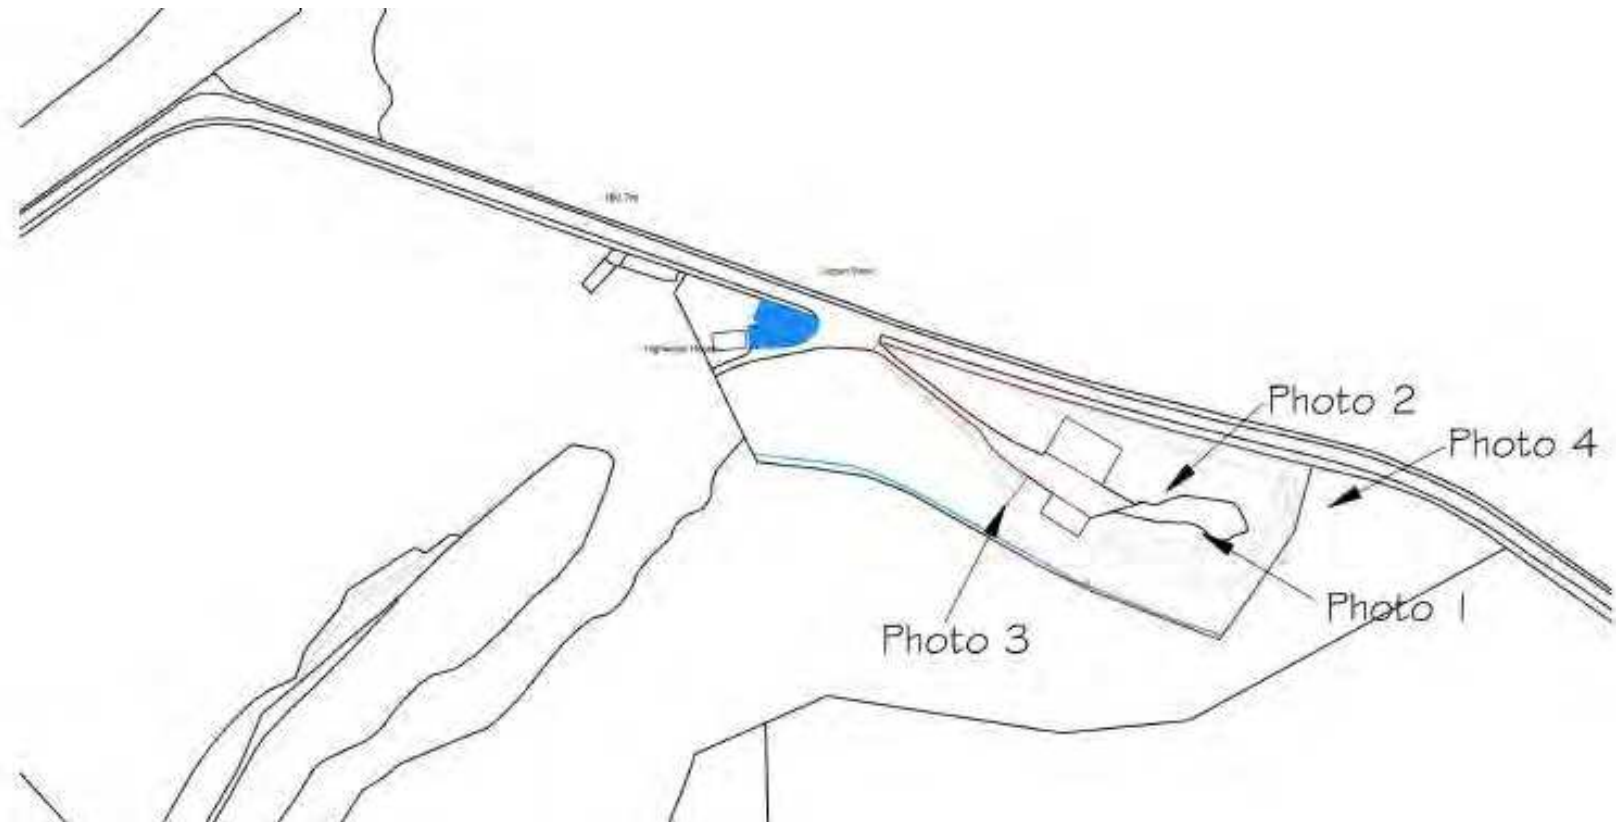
Extract from CDC/22/153/00 Existing Site Plan showing the location of the application site (Source: Capital Draughting Consultants).
